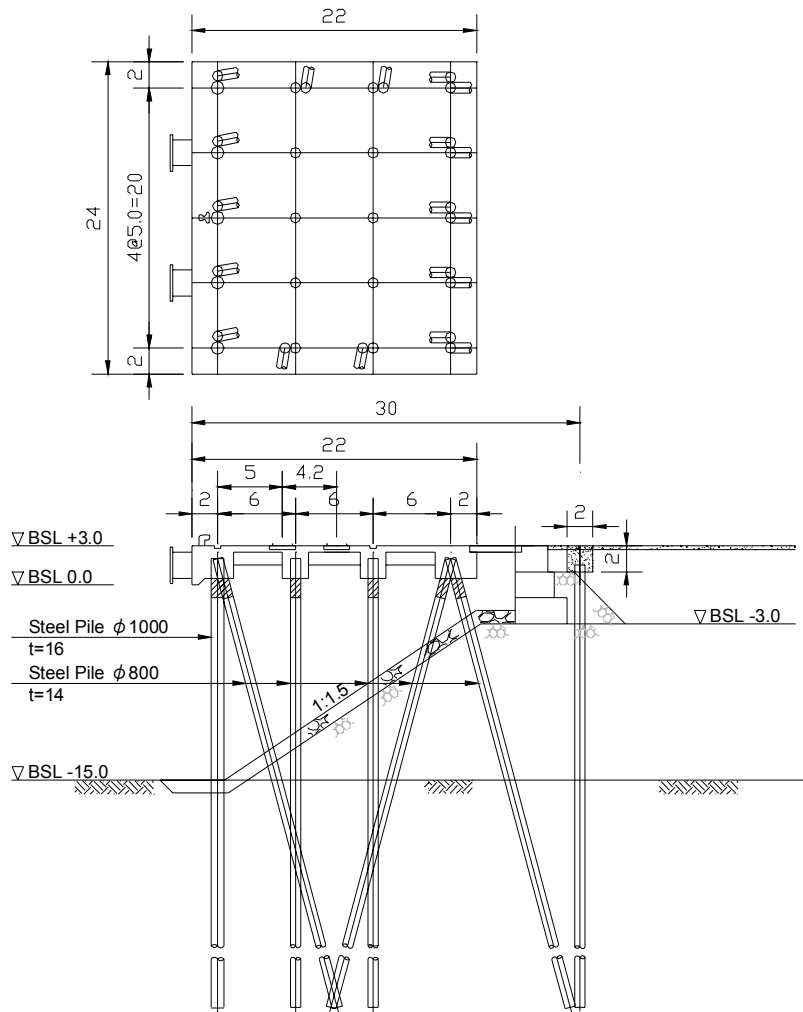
Cross-Section of Relieving Platform-Type Structure (Berth No. 6)
